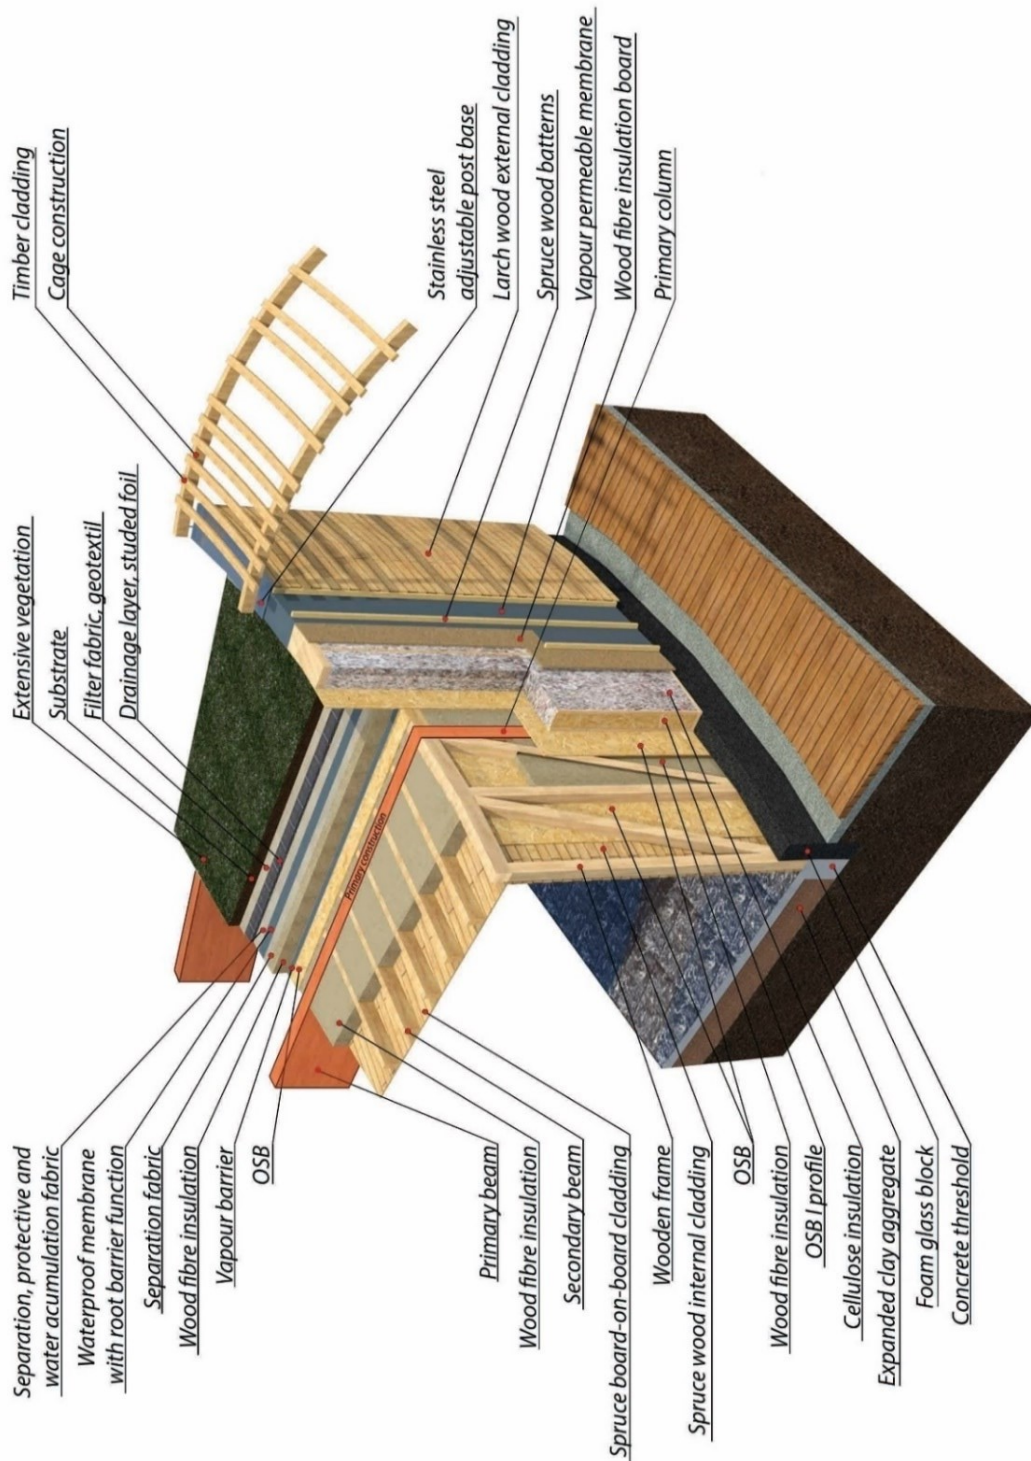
3D schema of the external wall (cellulose fibre insulation variant) and roof composition
